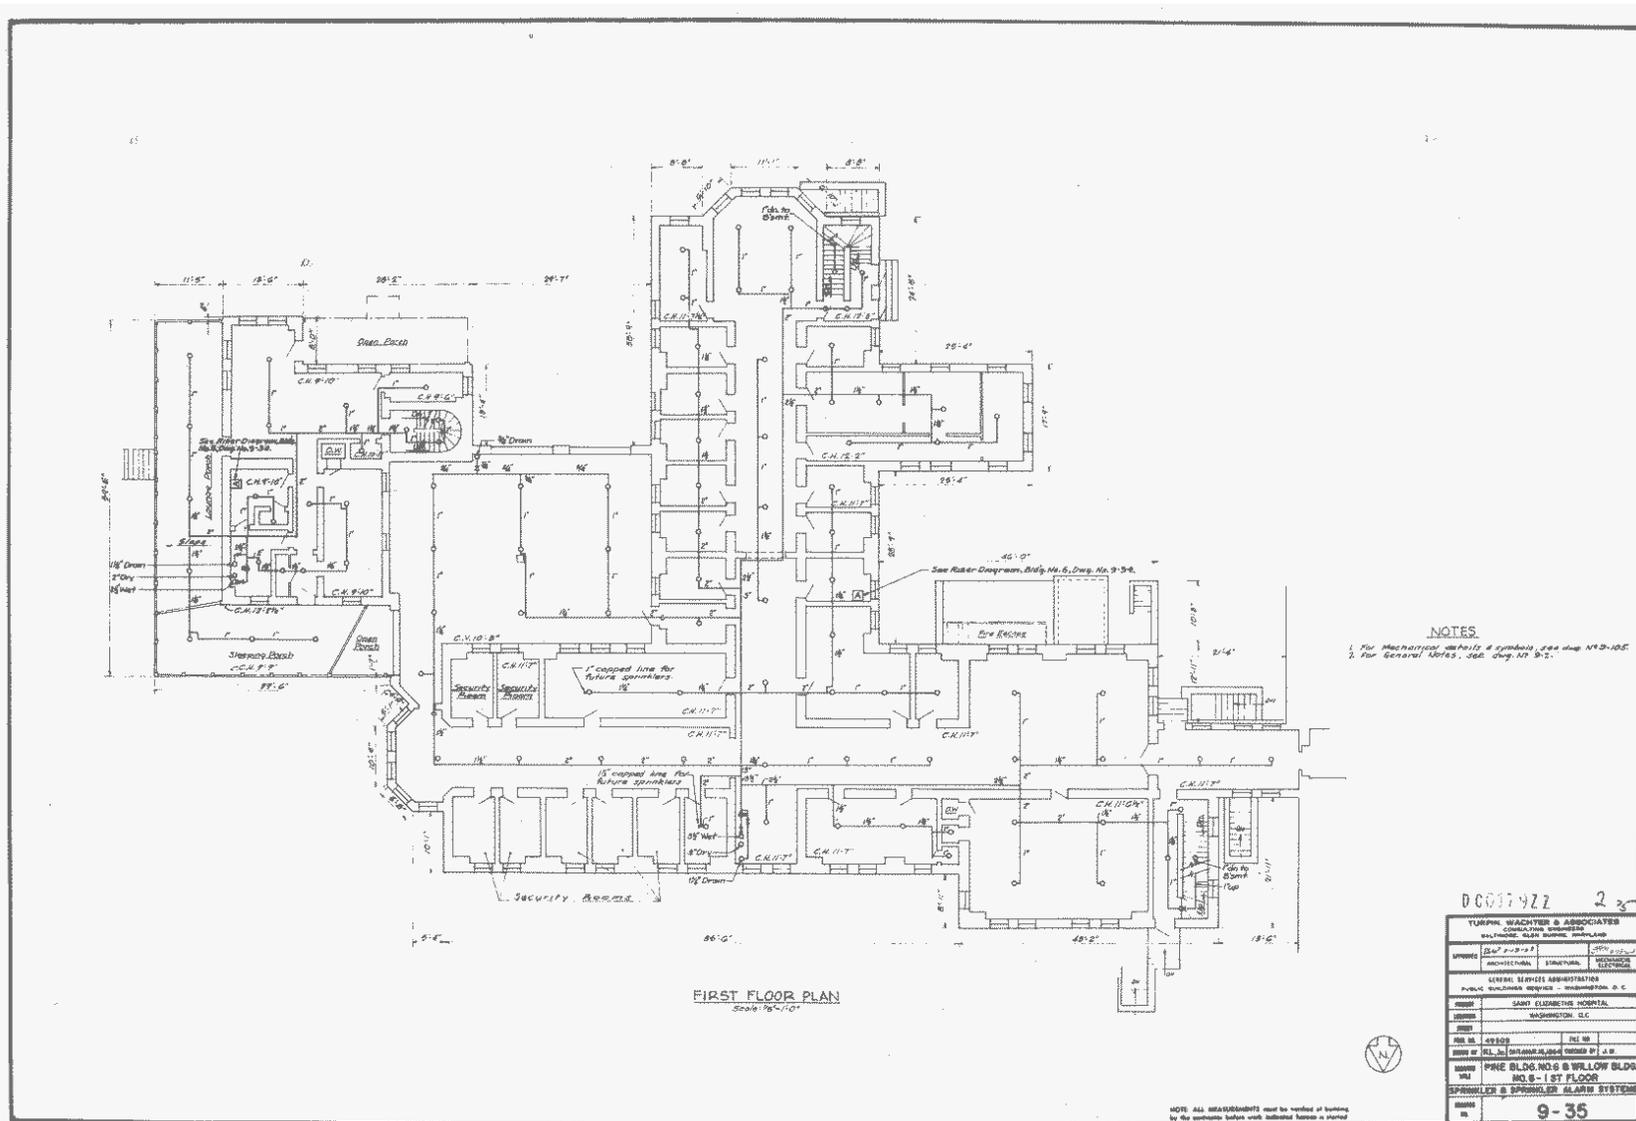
First floor plan of Pine showing fire suppression system improvements, 1964. Source: GSA Archives, image DC0179SE0002.
